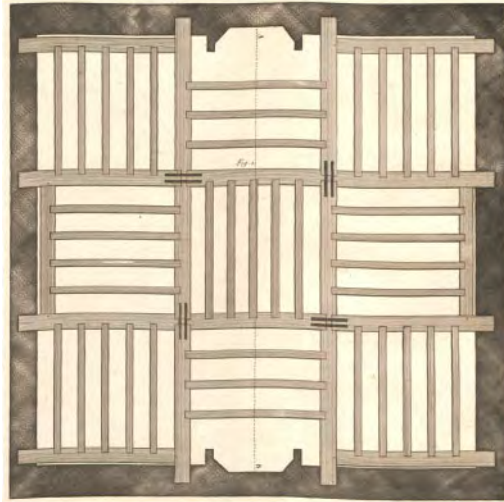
Serlio floor made of a single elementary module (Rondelet 1810).
